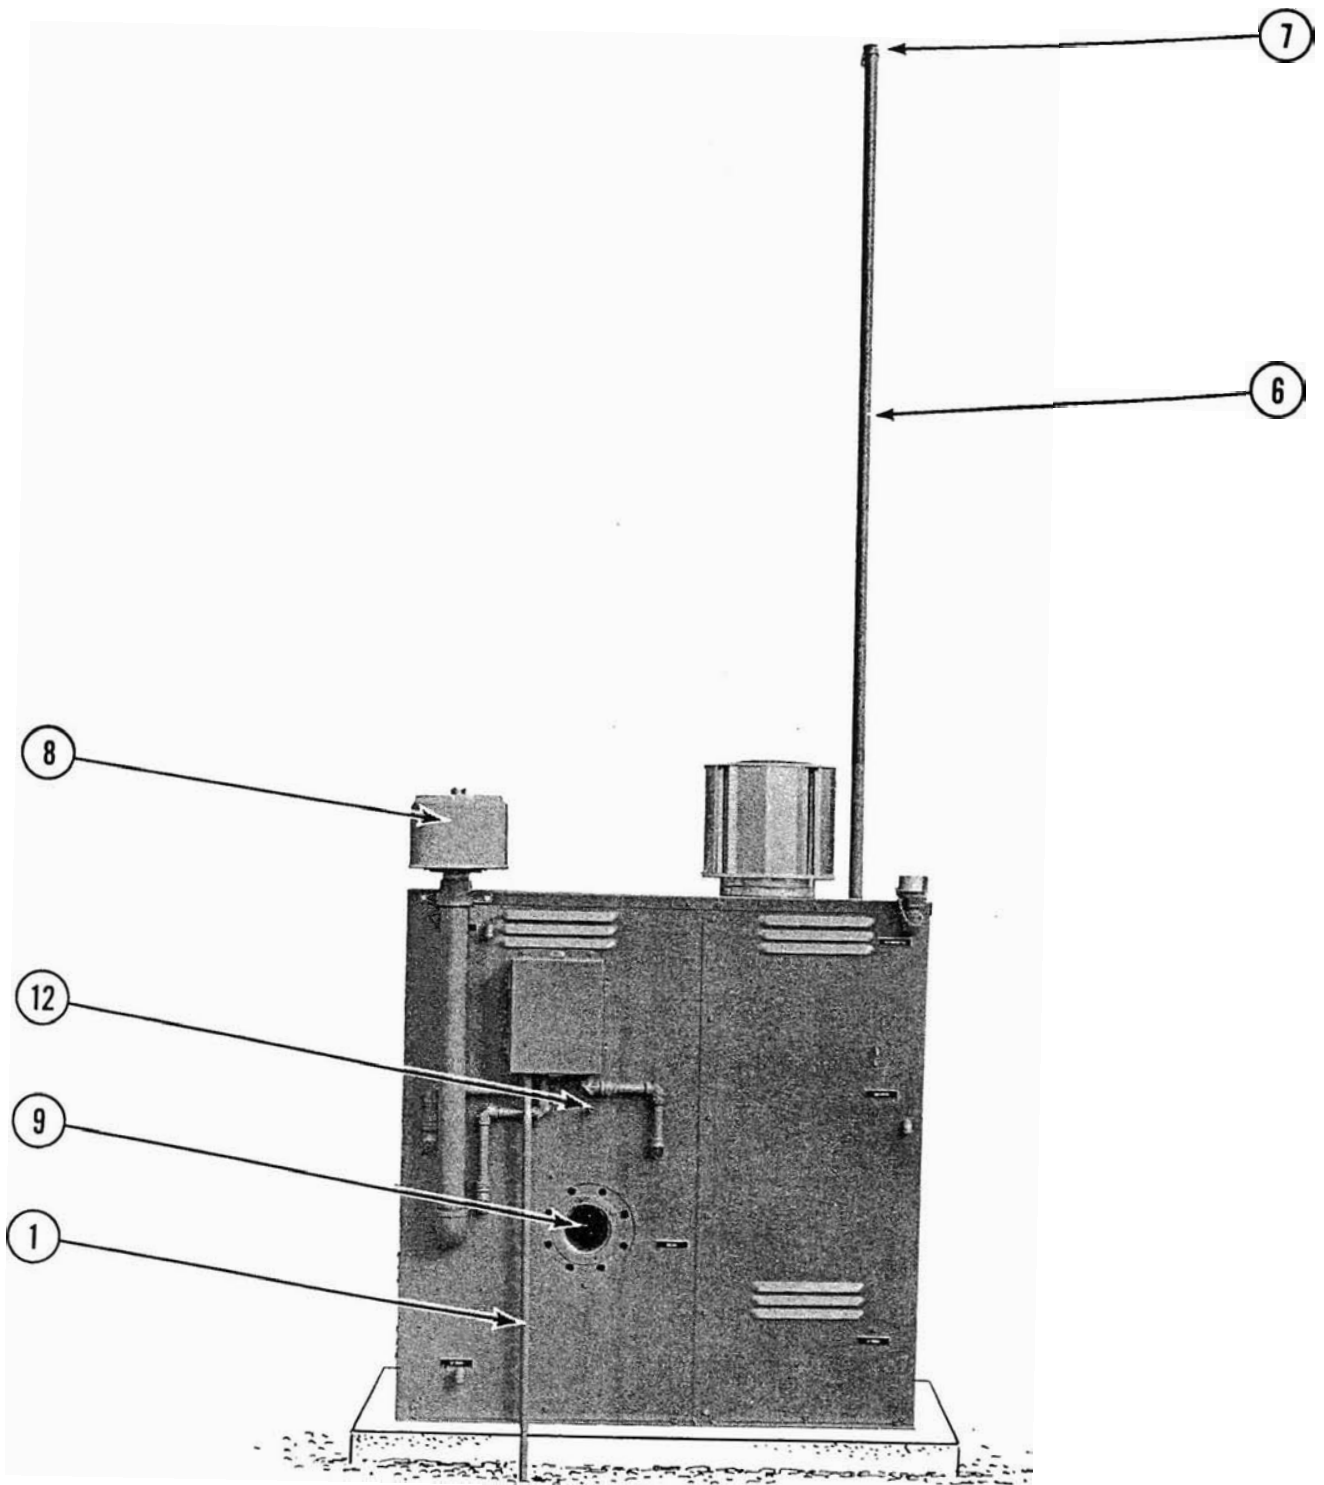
PAMW 100-6 Installation – Typical for -6
